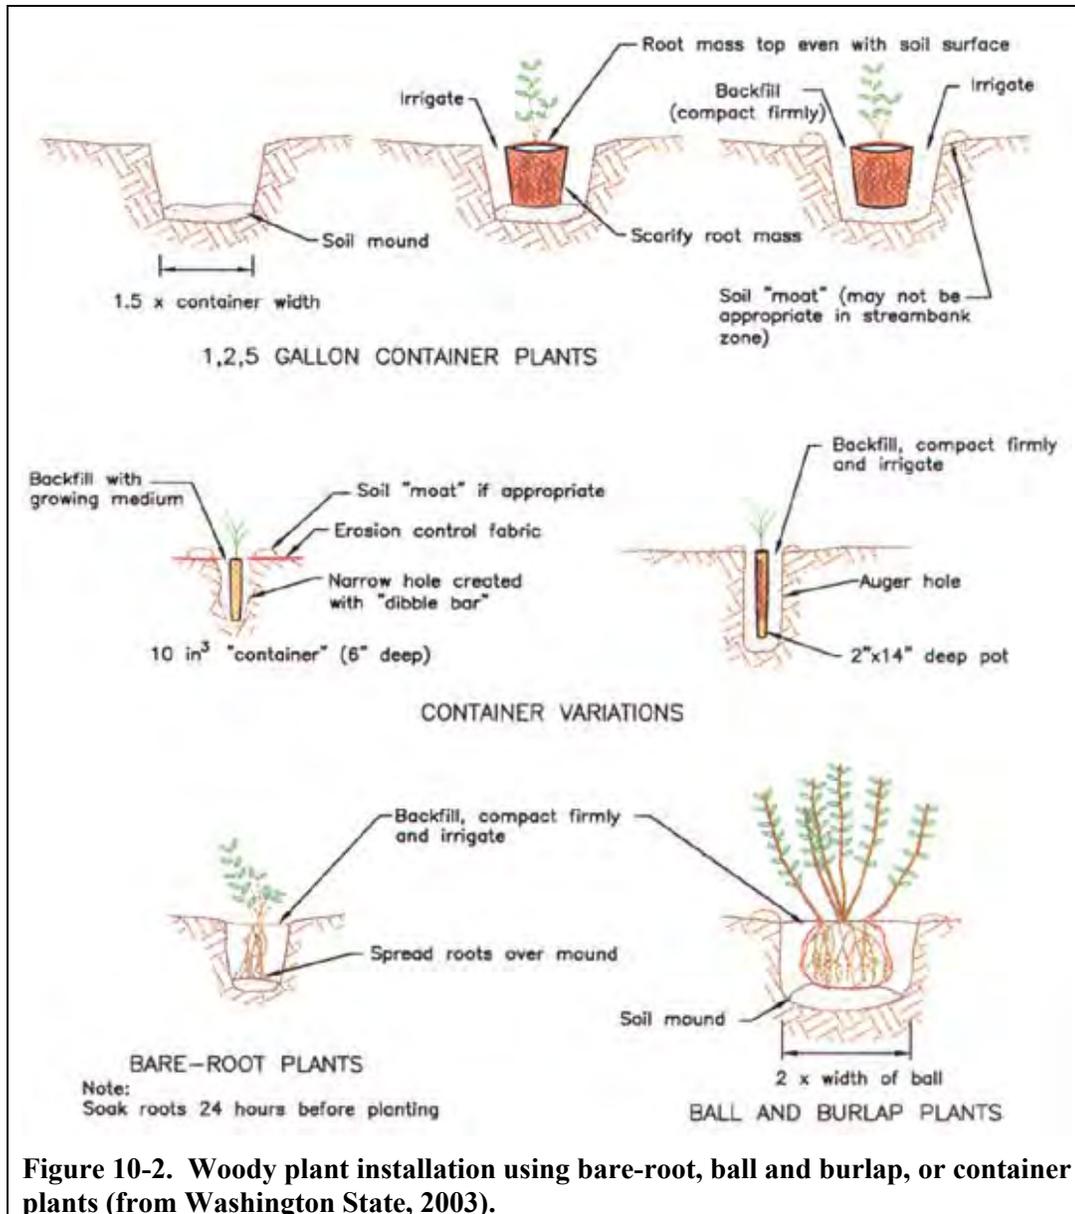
Woody plant installation using bare-root, ball and burlap, or container plants (from Washington State, 2003).
